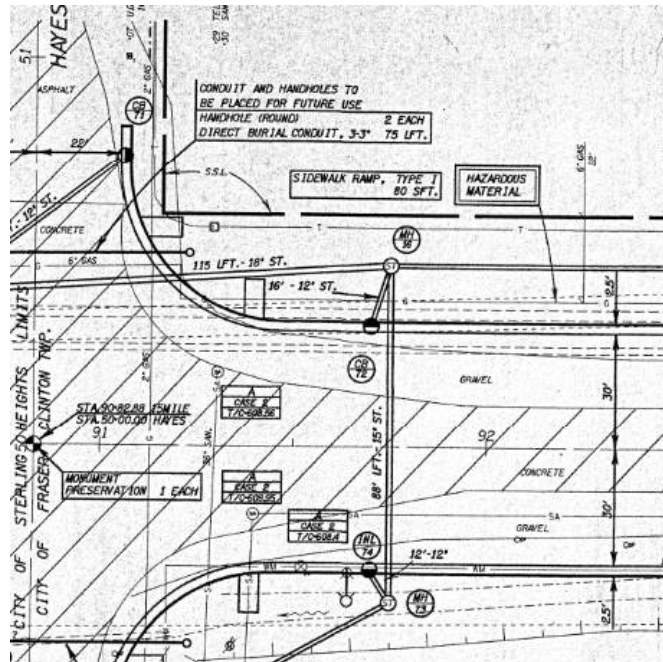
1995 15 Mile Road Widening – Water Main Alignment at Hayes Road
